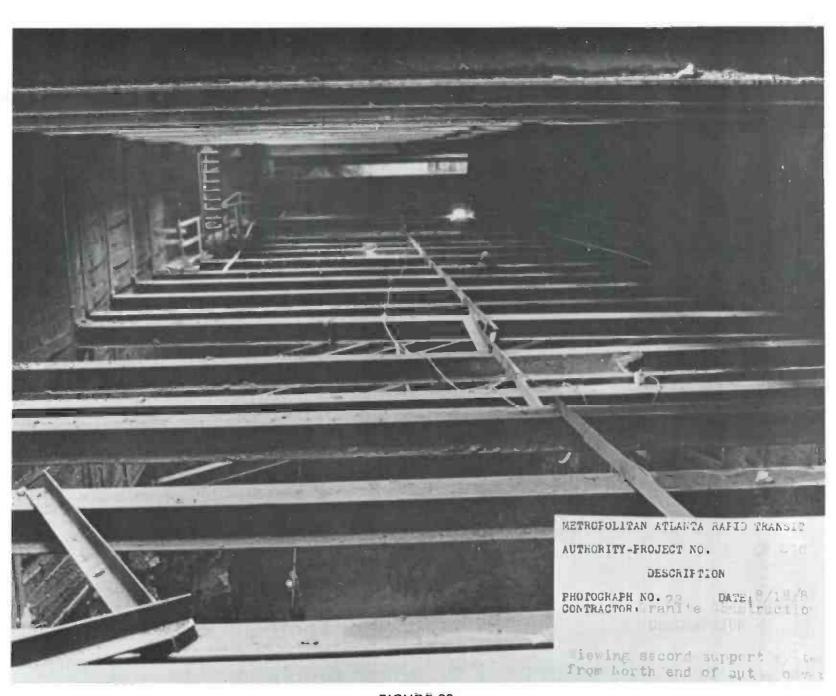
AS THE DEPTH OF EXCAVATION INCREASES, ADDITIONAL LAYERS OF BEAMS ARE INSTALLED TO BRACE THE SOLDIER PILES
